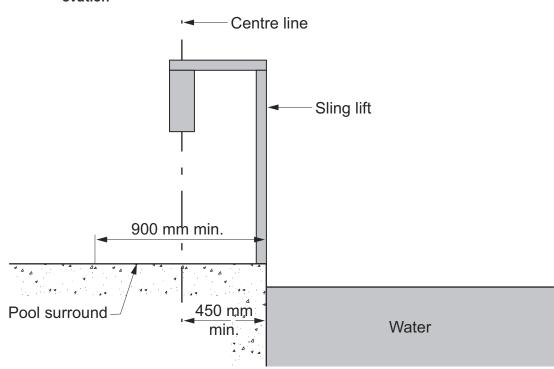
C5b: Clear swimming pool surround space for sling lift in the transfer position — Sectional elevation
